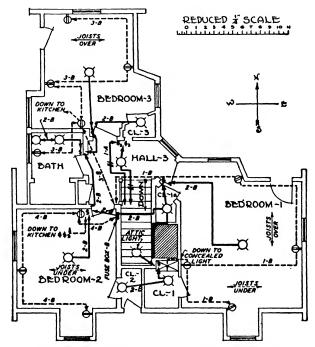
Wiring Plan of Second Floor of 1 1/2 - Story Building
